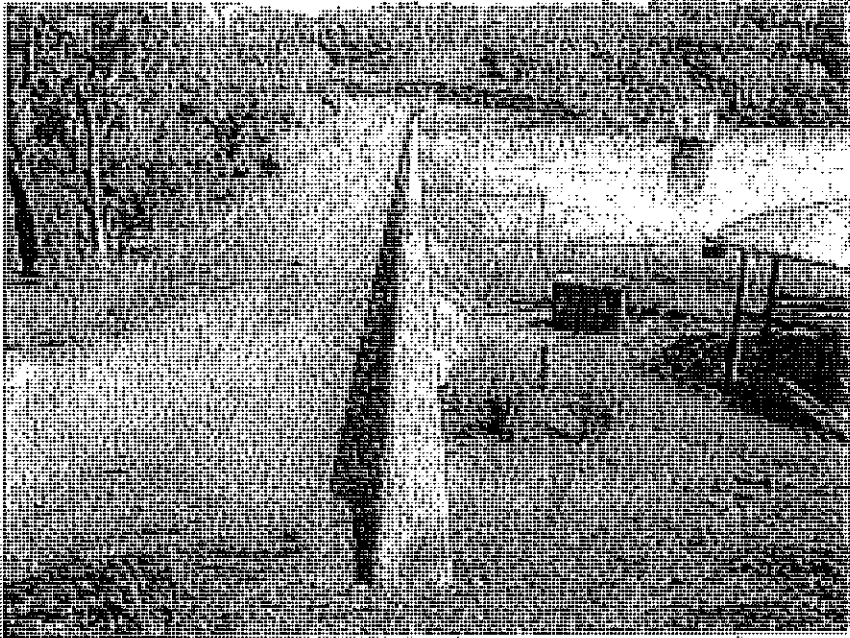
Looking along fence on downstream side of dam crest from left abutment
